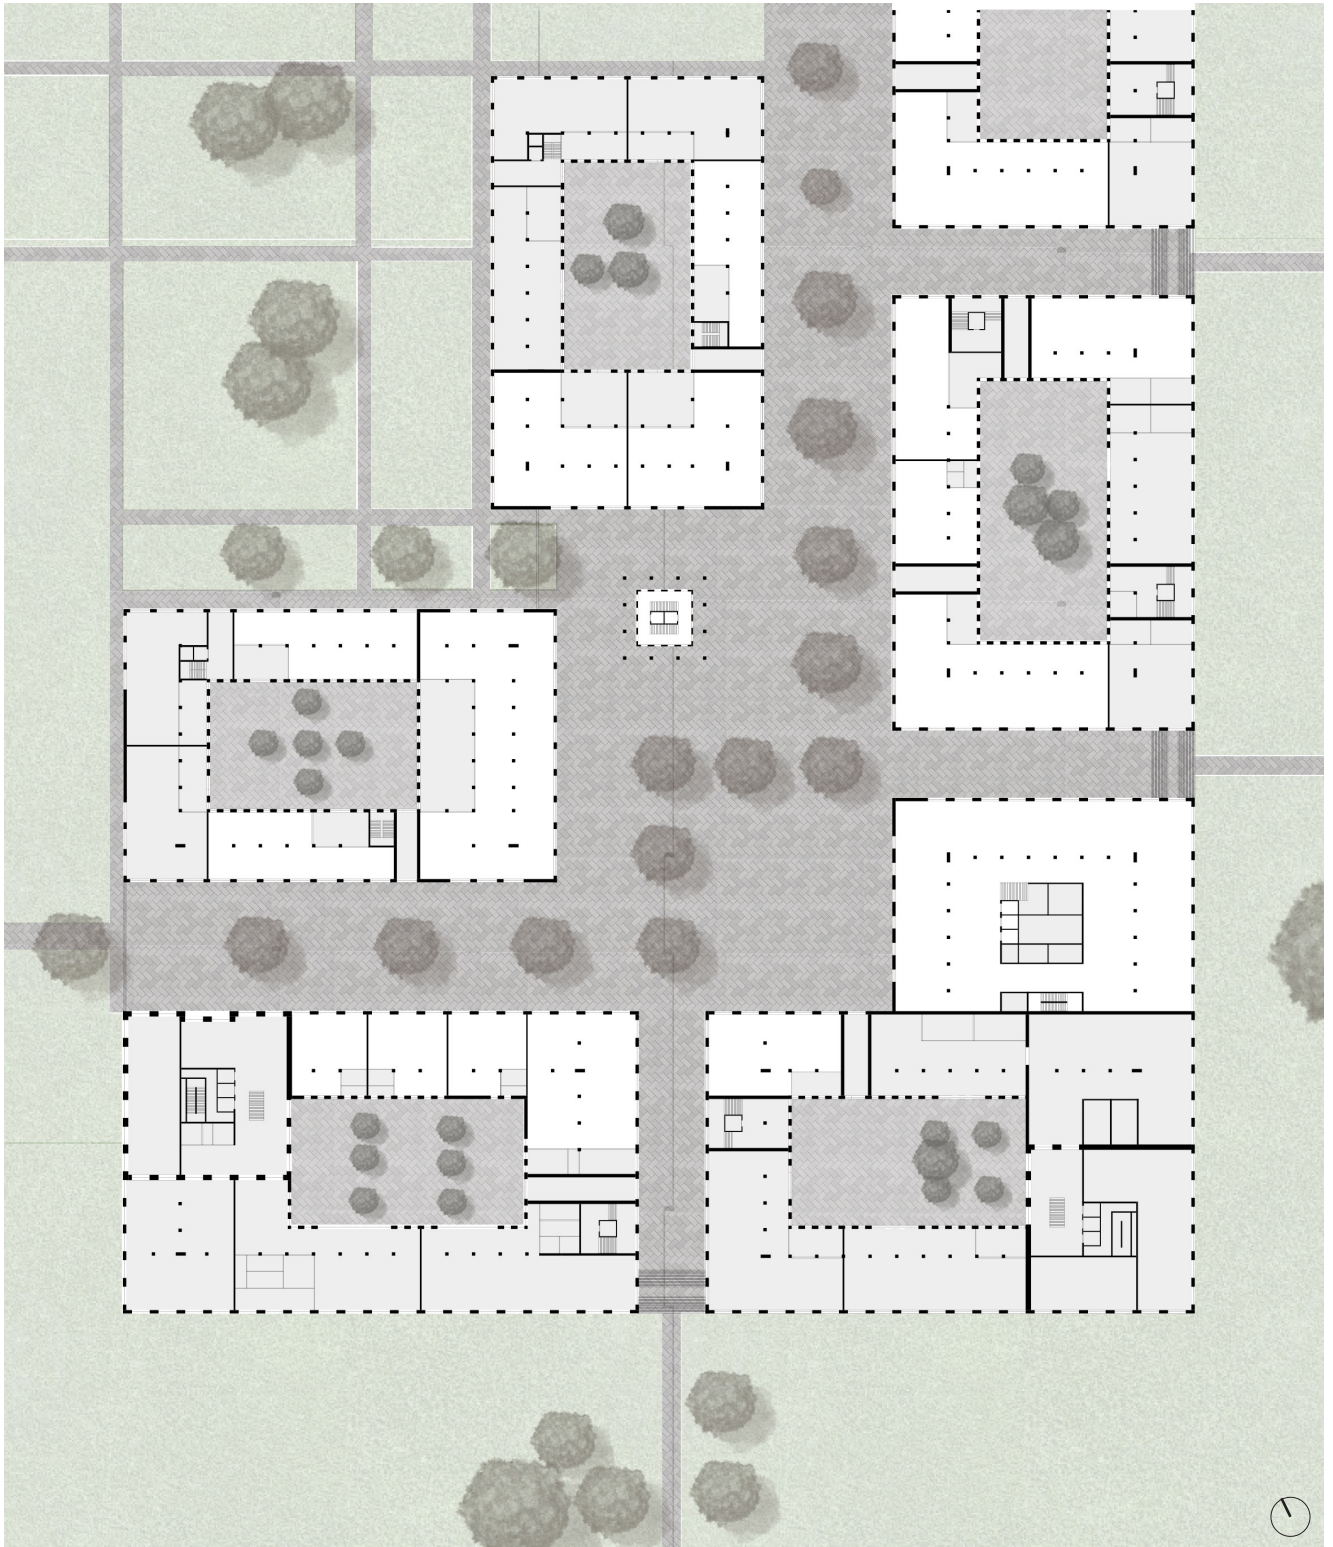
Groundfloor of southern piazza with surrounding buildings 1:1000
